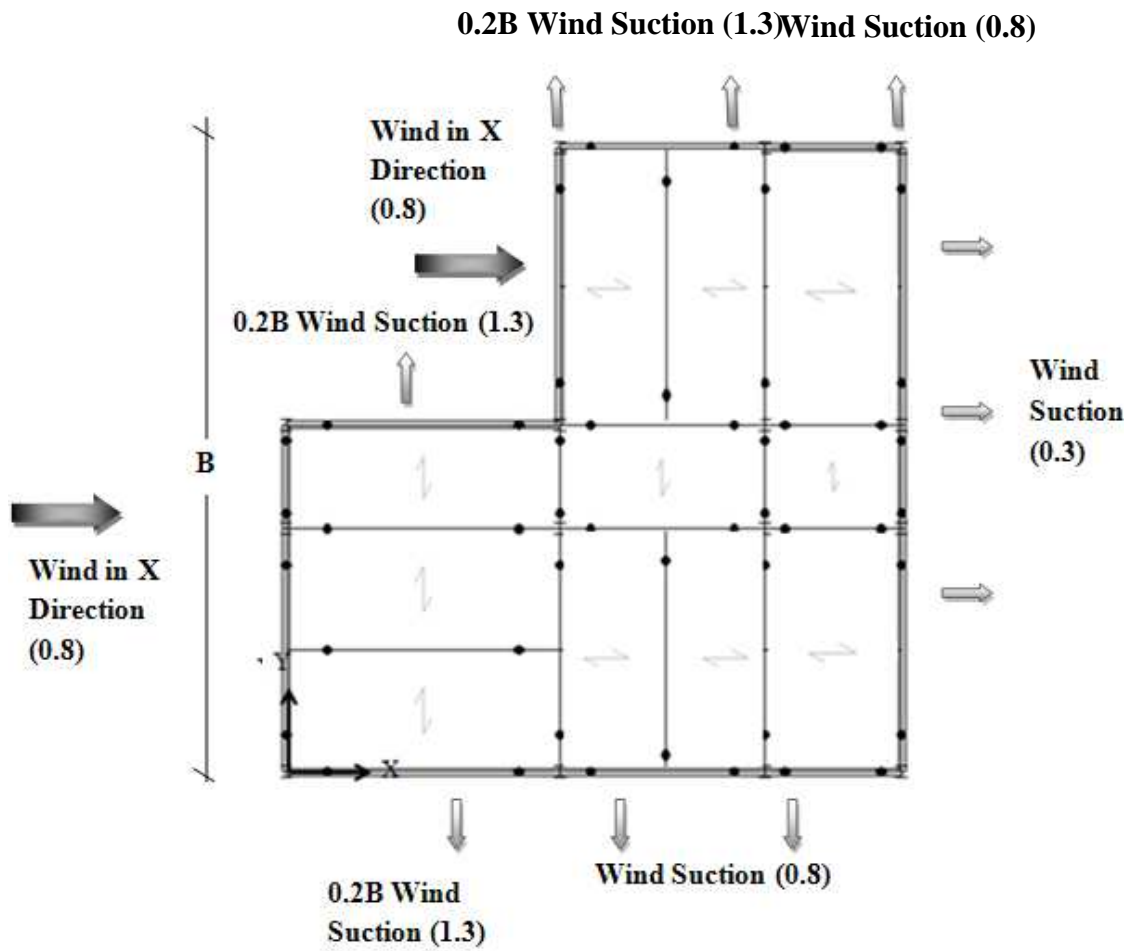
(a): Building layout indicating wind in X direction with suctions for asymmetrical plan and symmetrical section.
